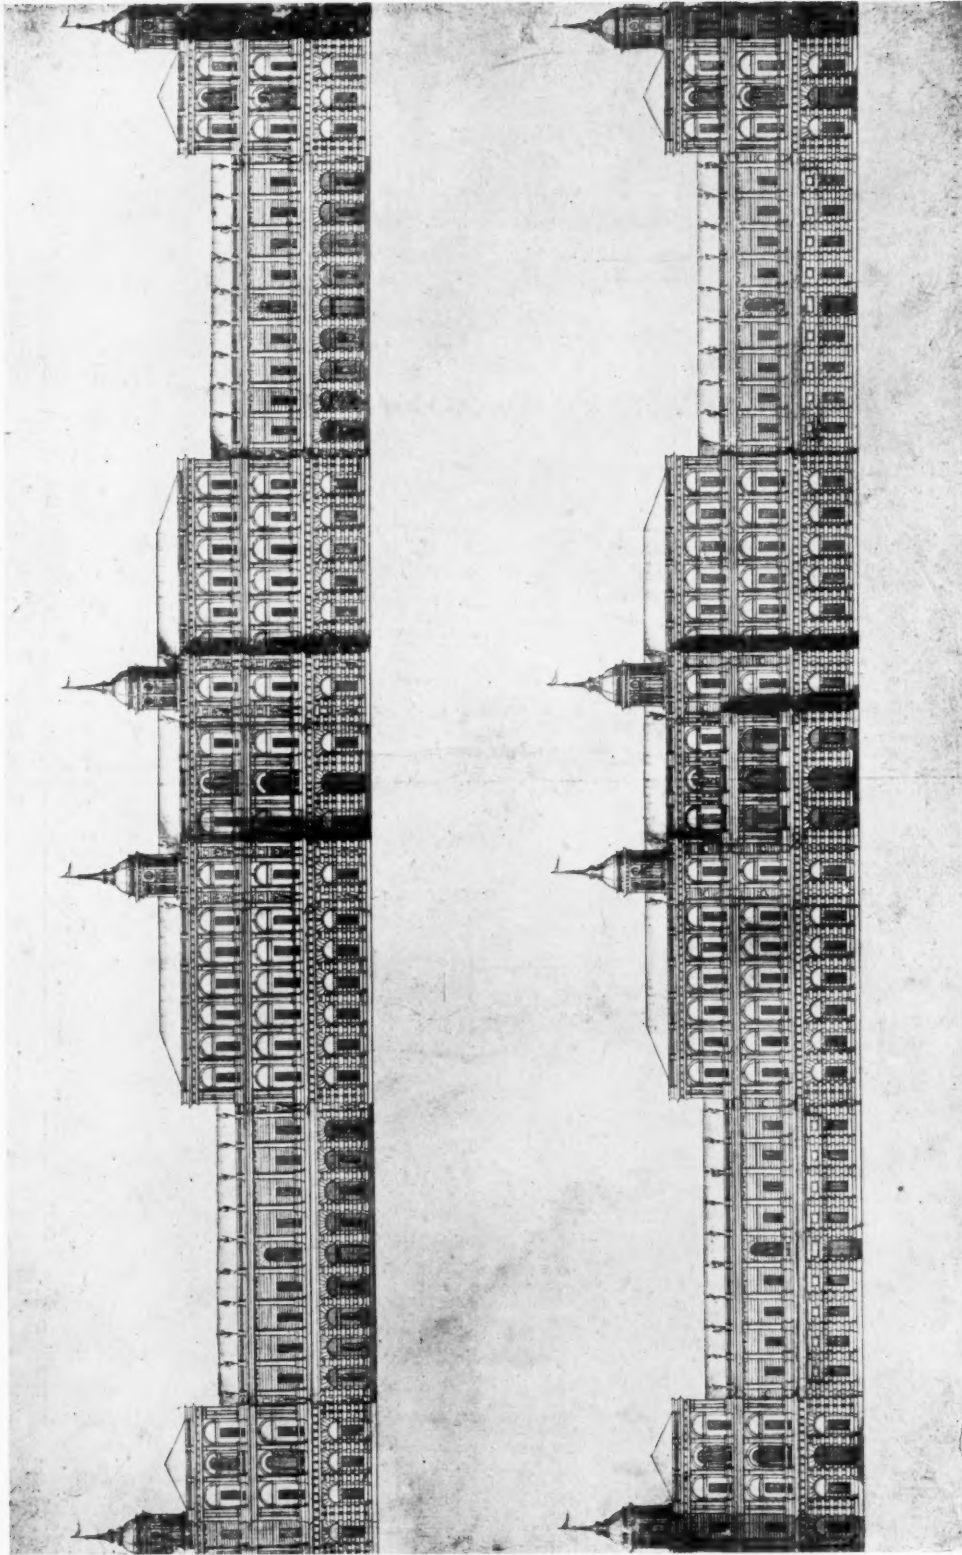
EAST AND WEST ELEVATIONS OF THE PLAN SHOWN BY FIG. 6
